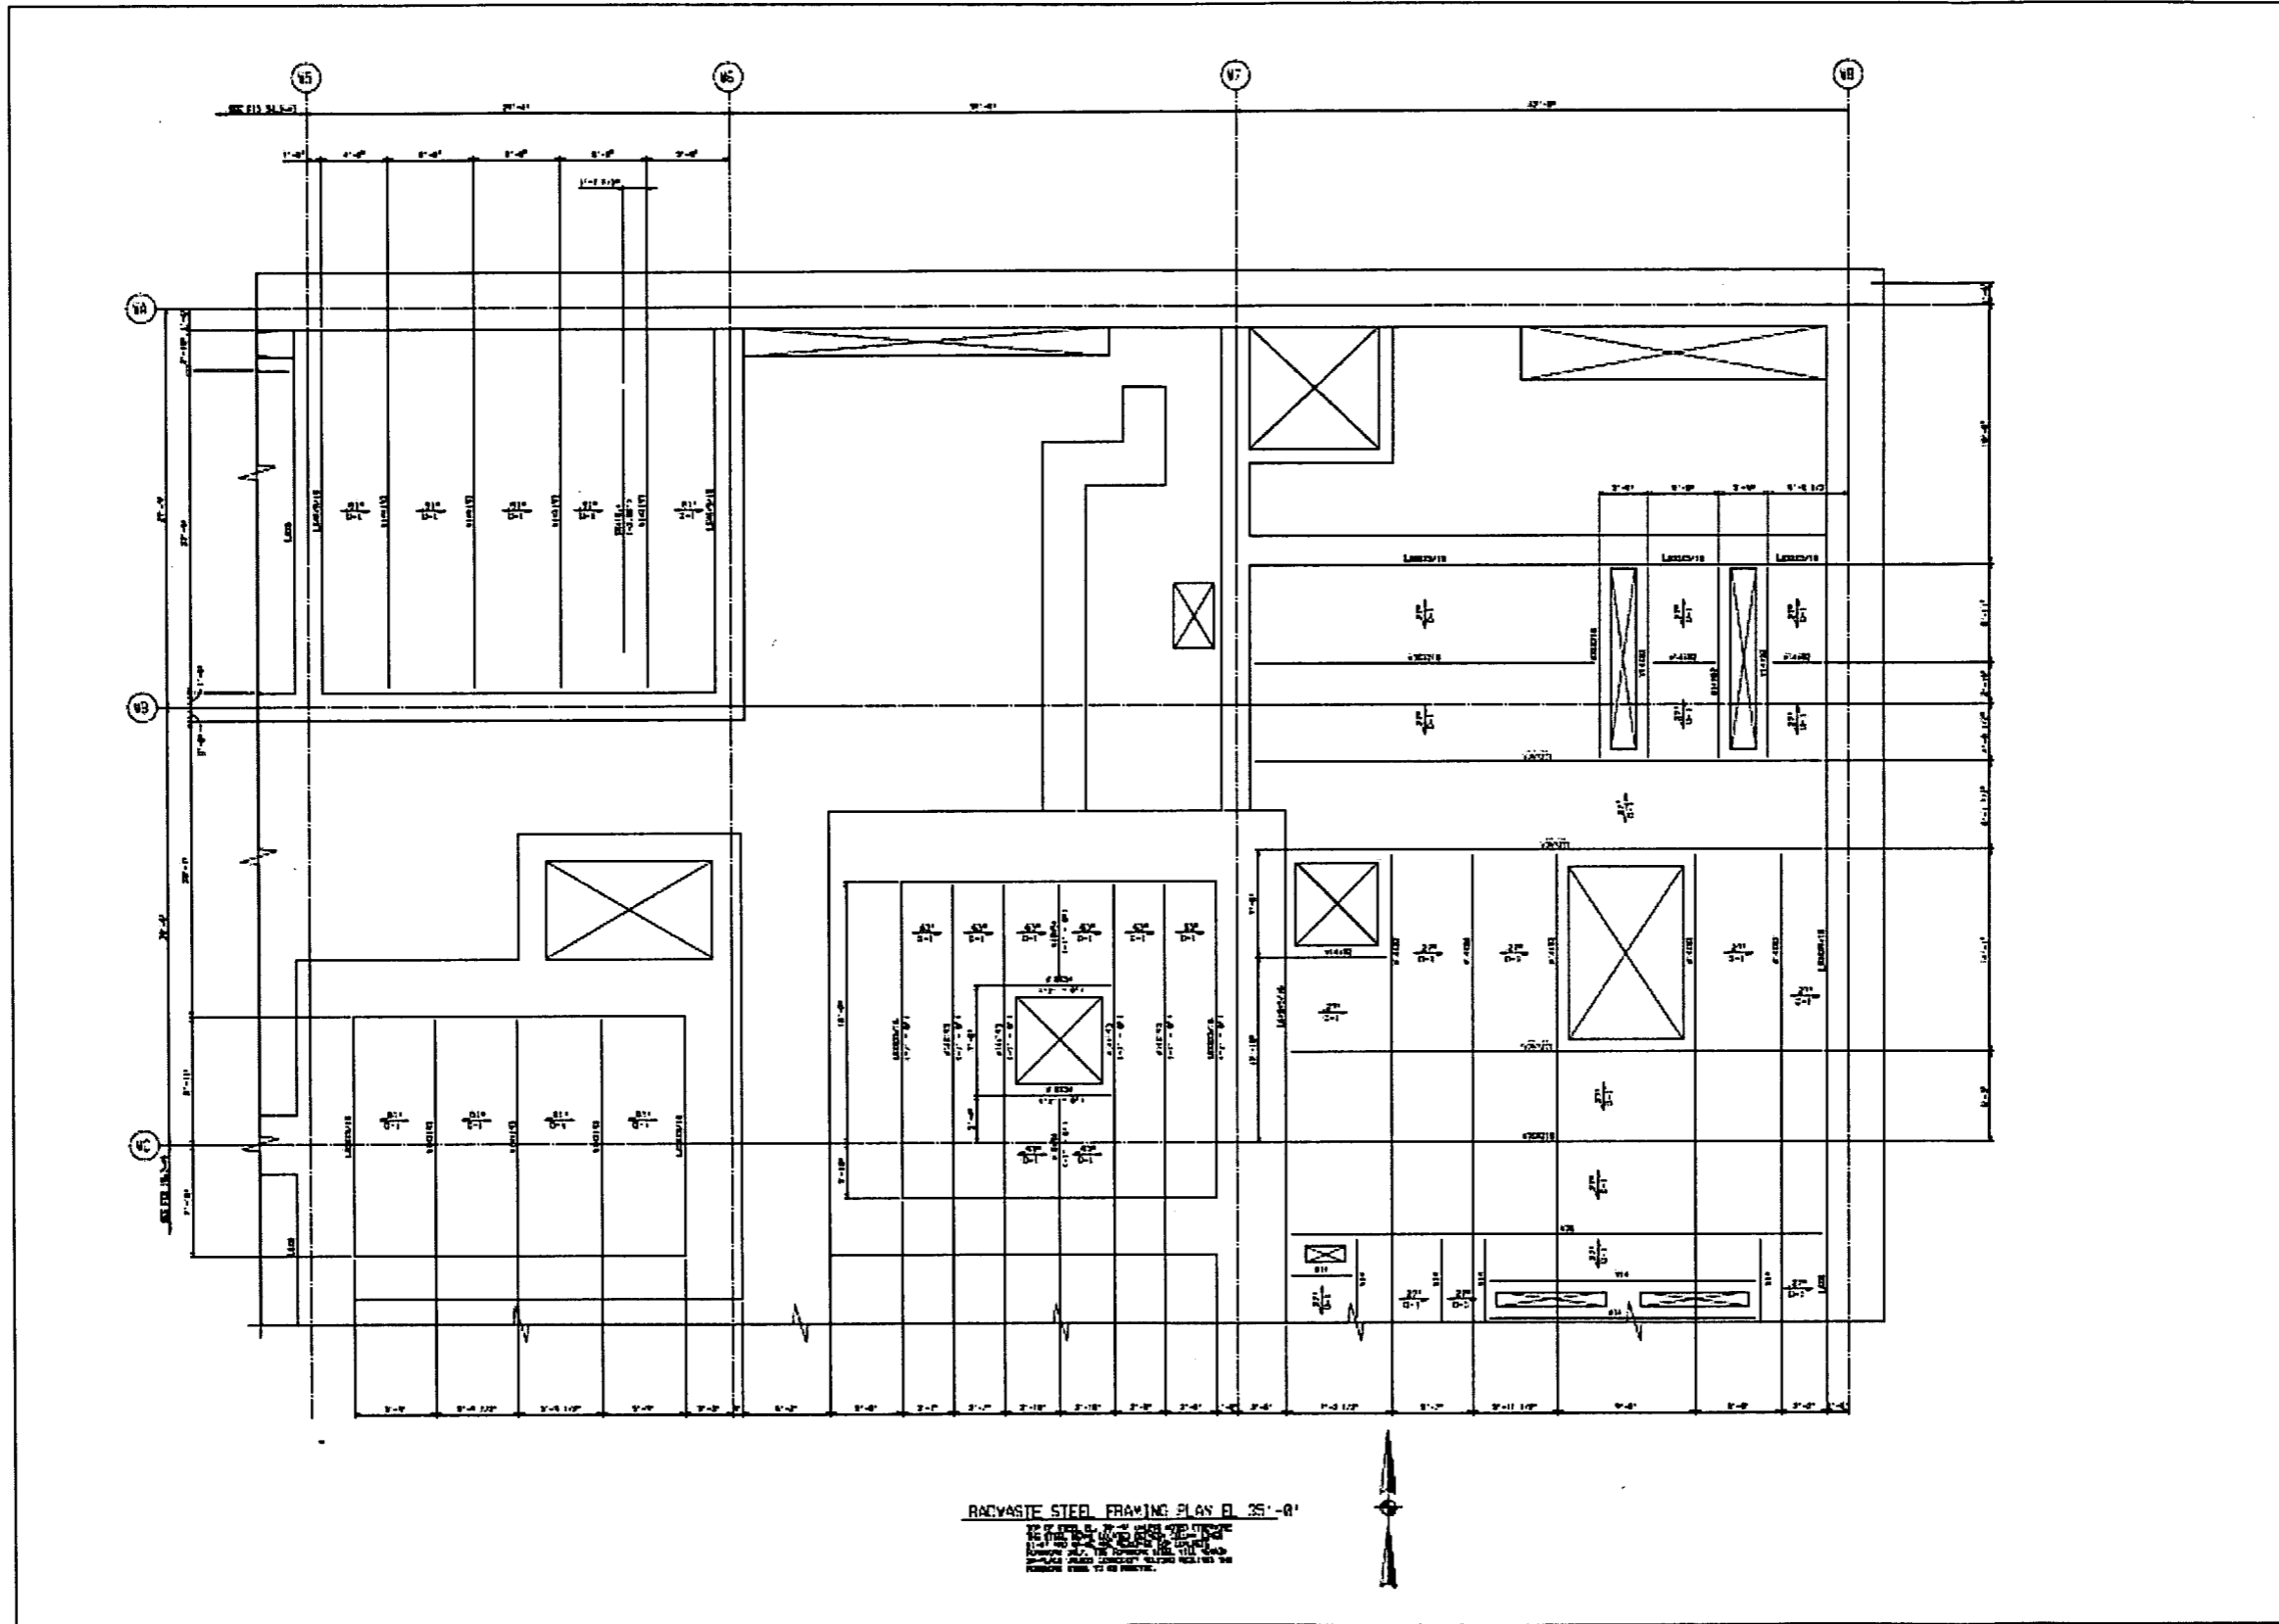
H.3-44 EL 35'-0" STEEL LAYOUT BETWEEN COLUMN LINES W5-W8 AND WA-WC
